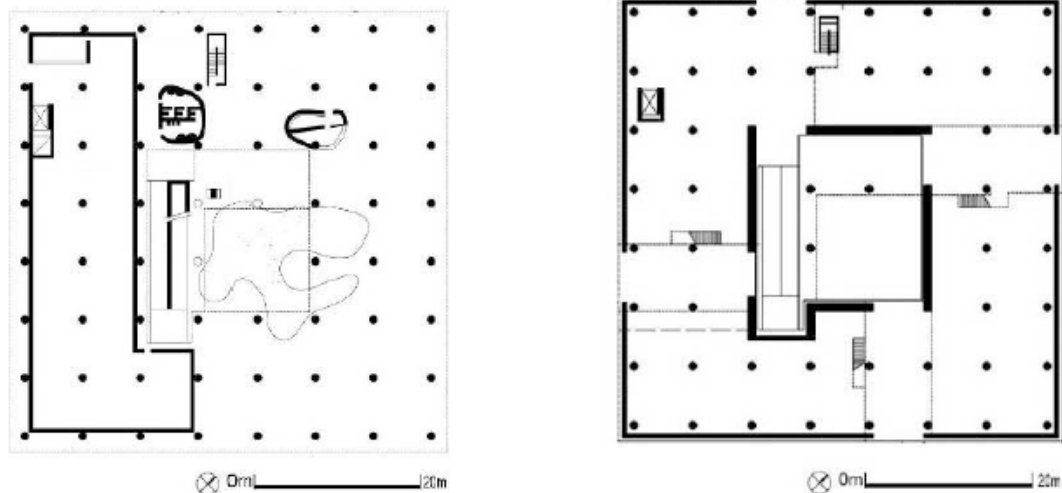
Ground floor plan (left) and first floor plan (right) of the N. C. Mehta Museum in Ahmedabad. (redrawn by the authors).
